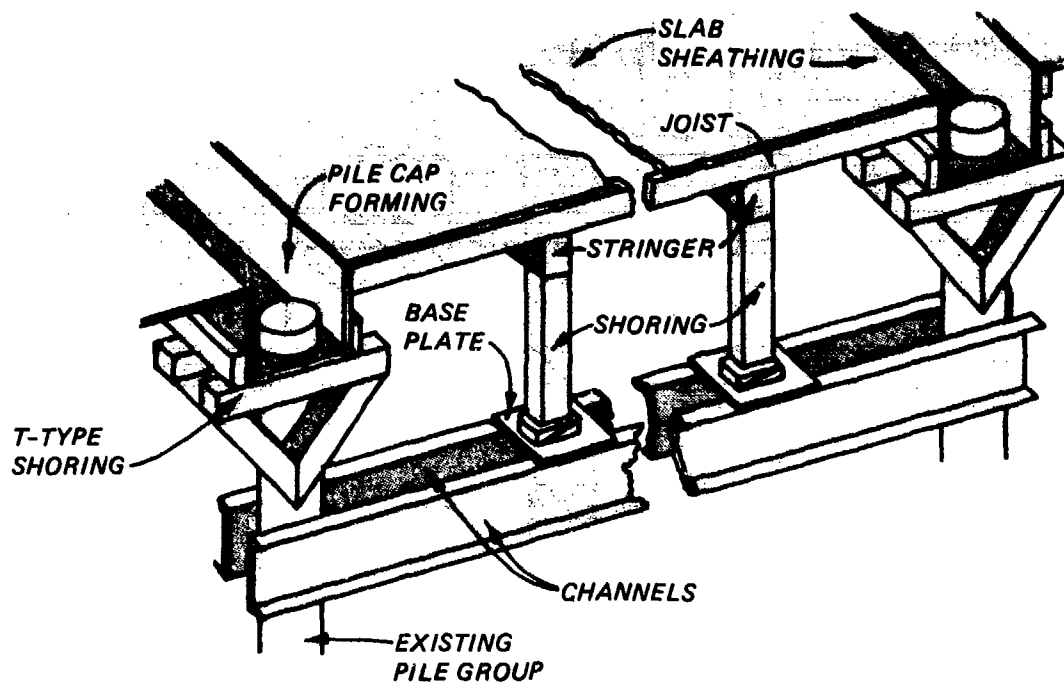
Detail of horizontal shoring using steel channels to support intermediate shoring
